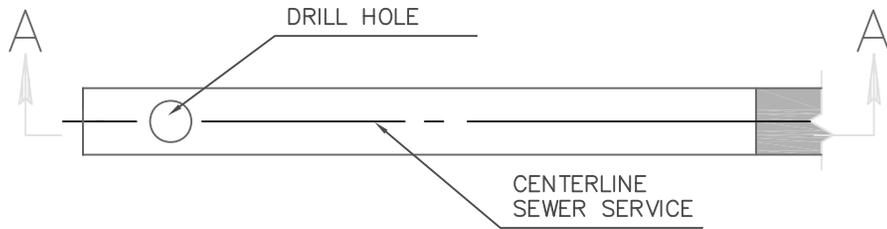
STANDARD DETAIL	PRESSURE MAIN CONNECTION EXISTING MANHOLE	CITY OF KINGMAN	N.T.S. DETAIL NO. 432
